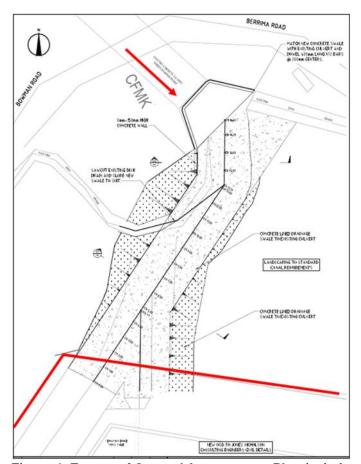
Extract of General Arrangement Plan (existing concrete culvert denoted by red arrow and site boundary outlined red) (Source: Nearmap)
